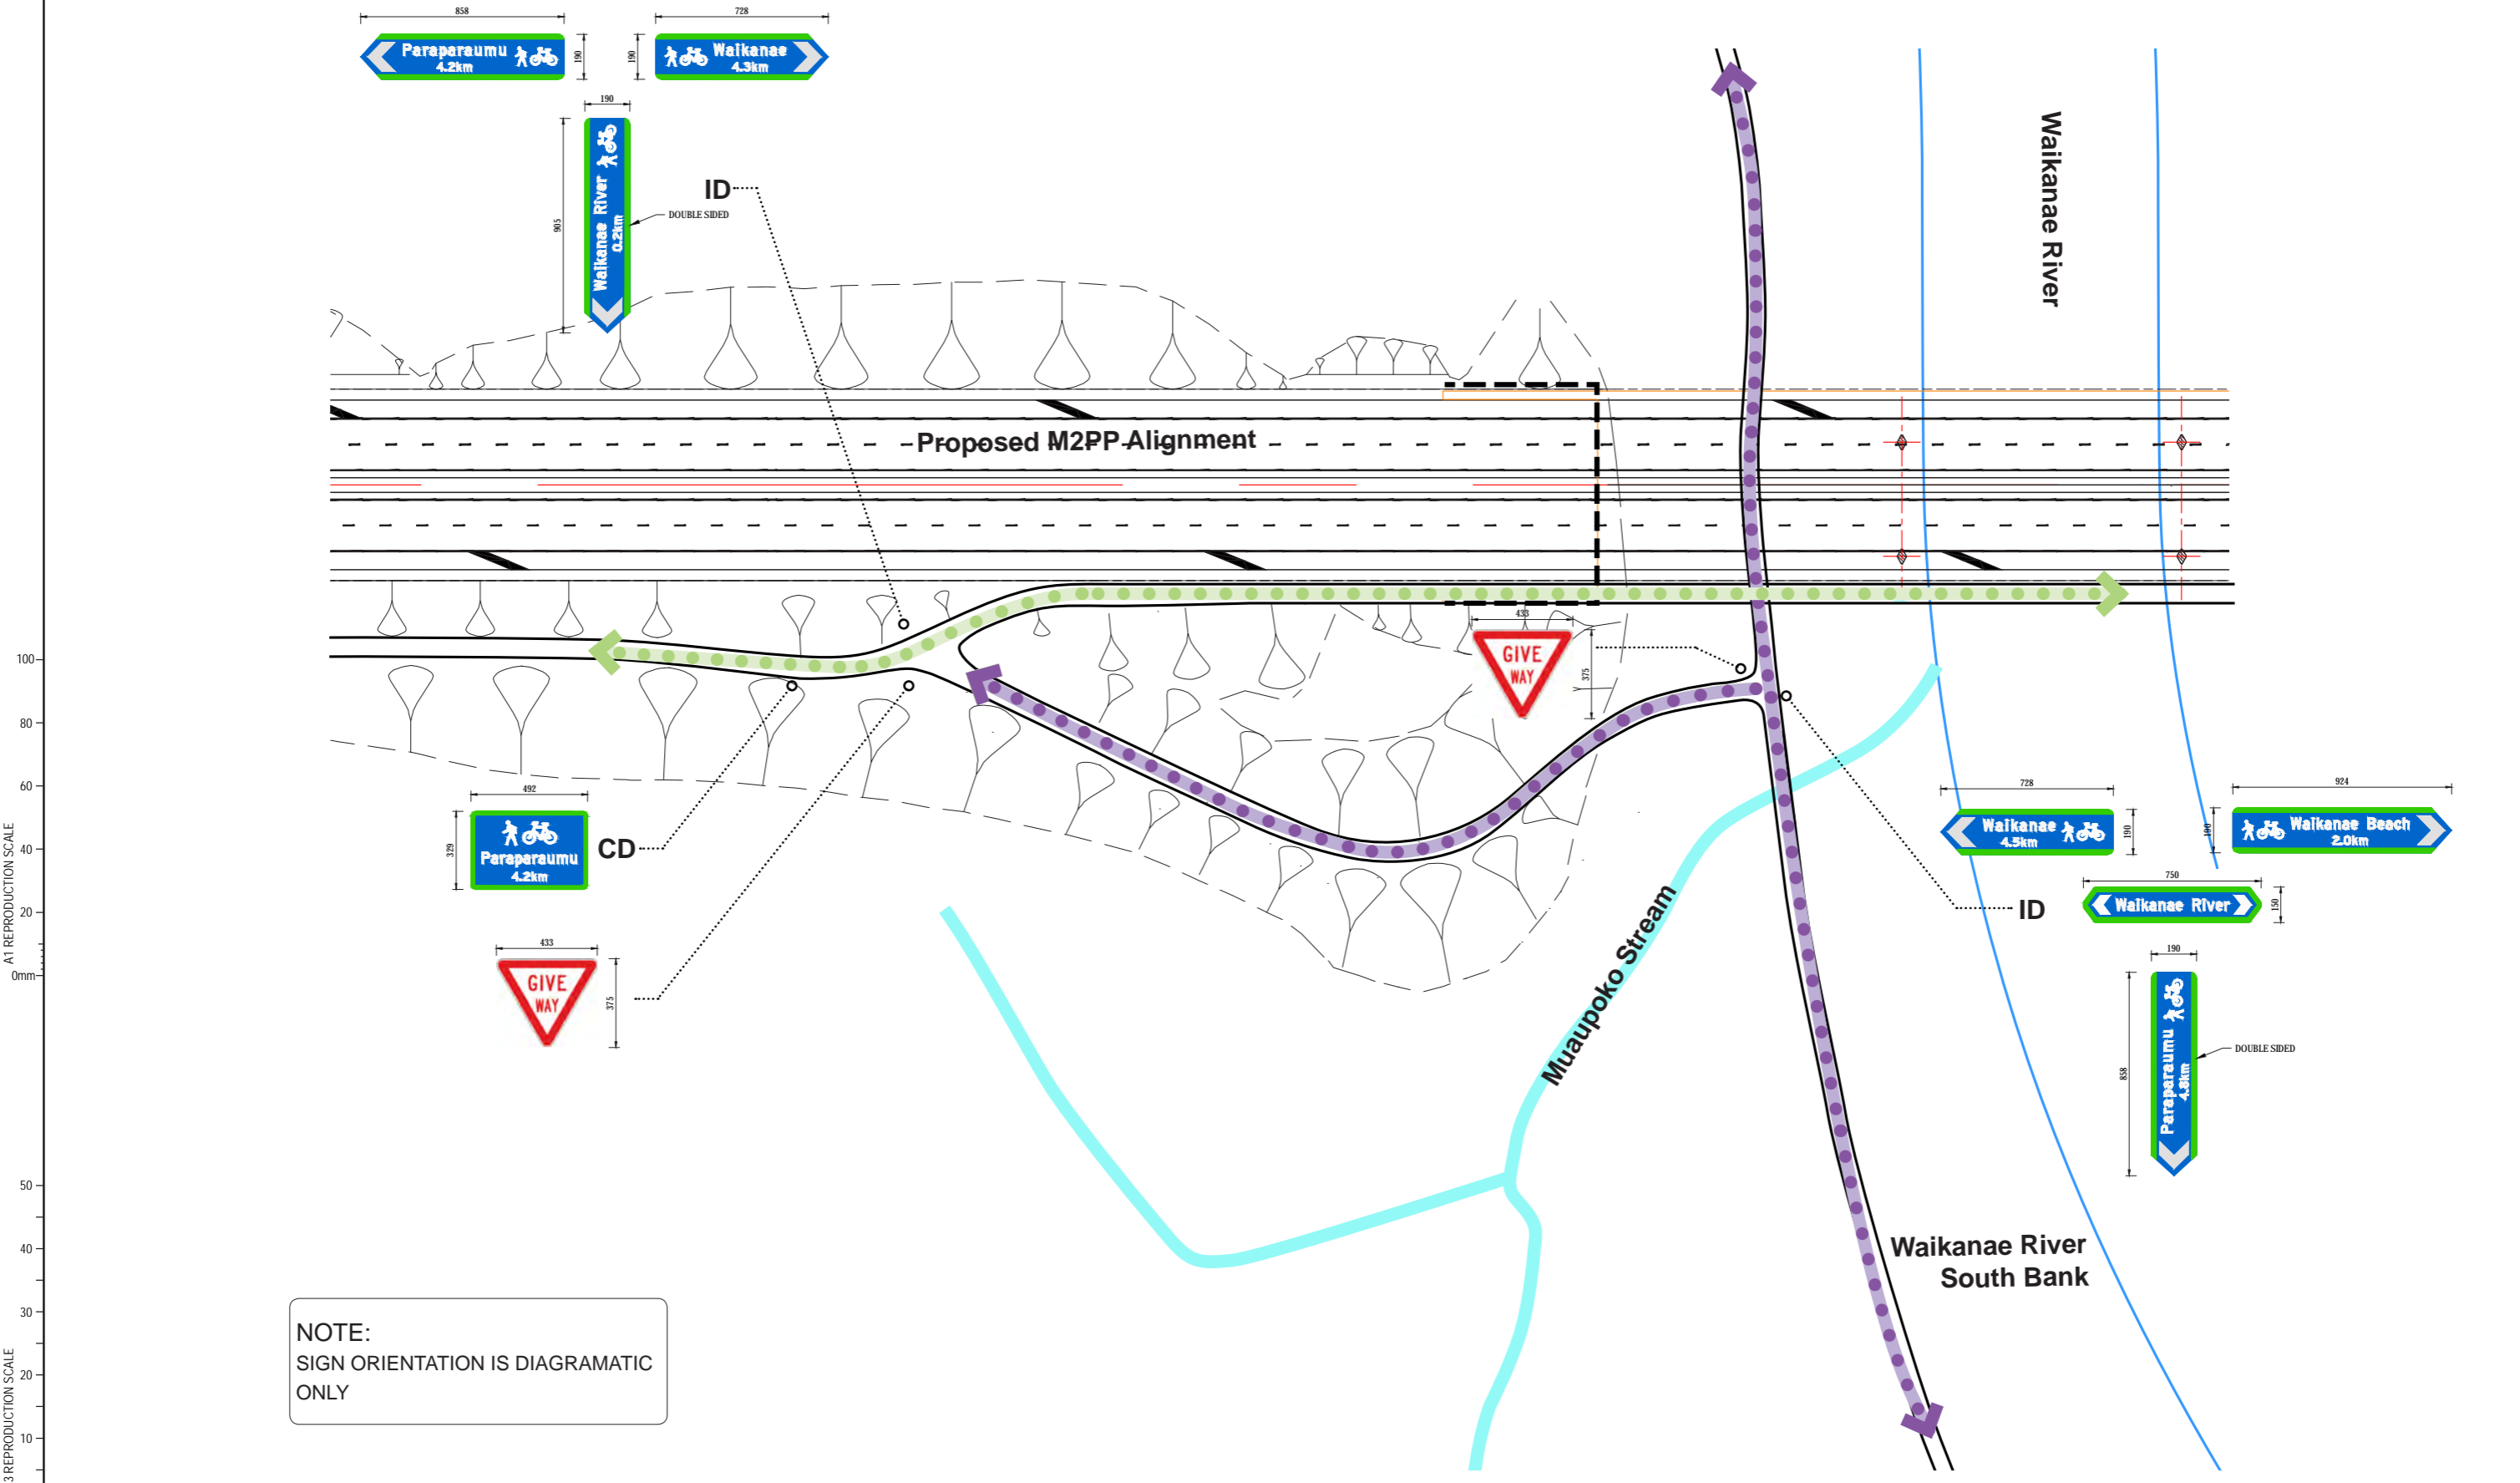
DETAIL PLAN - SIGNAGE - WAIKANAĒ RIVER SOUTH BANK
